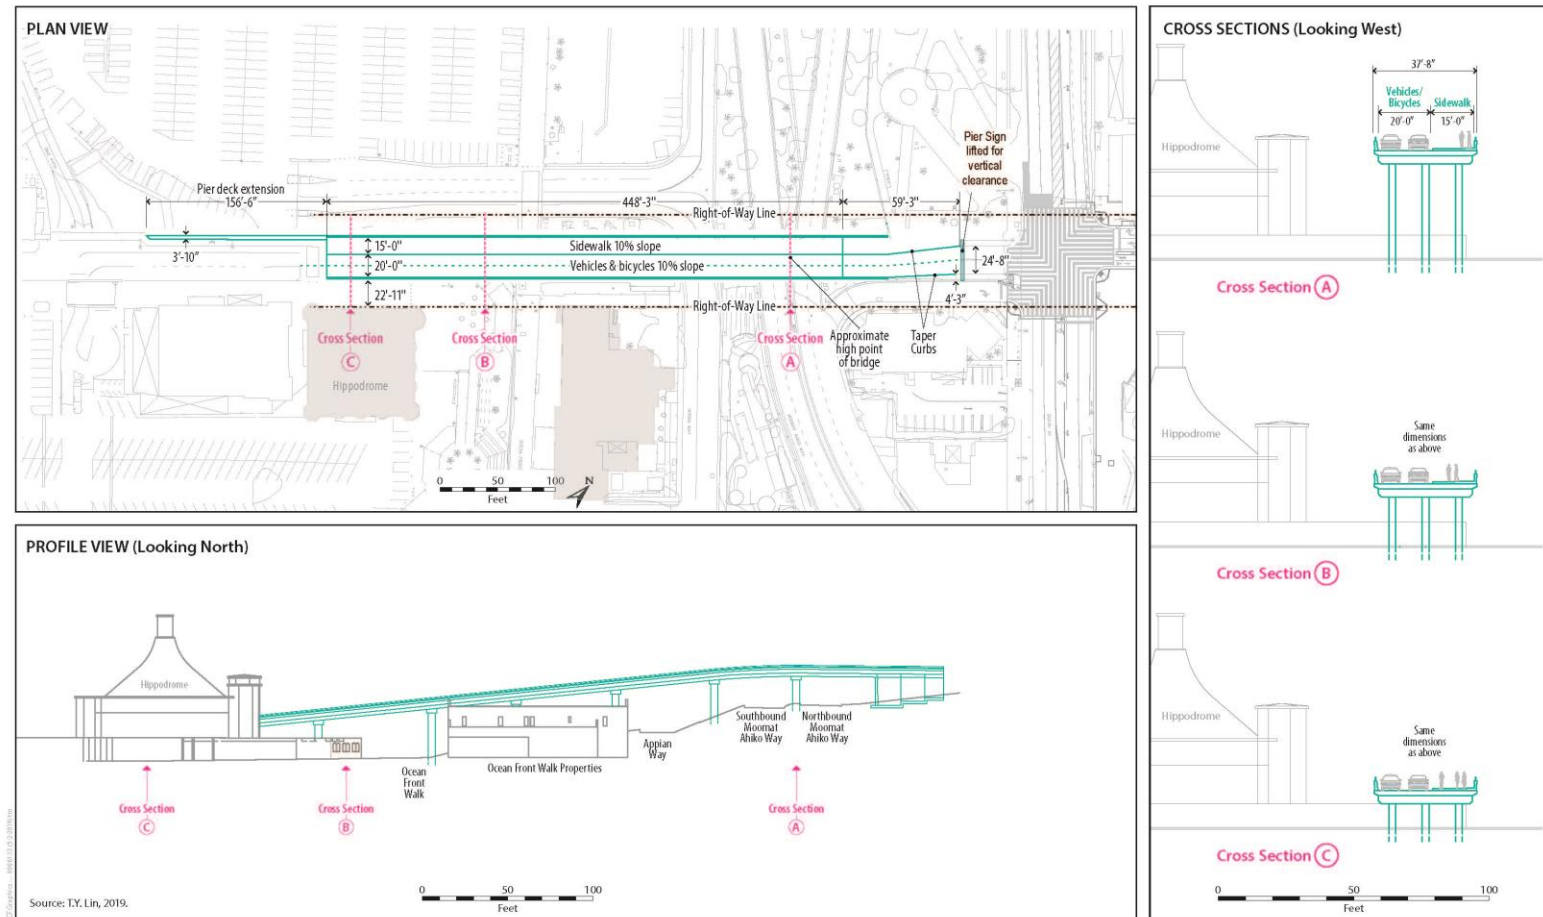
Alternative 1, In-Kind Pier Bridge Replacement with Northside Sidewalk
